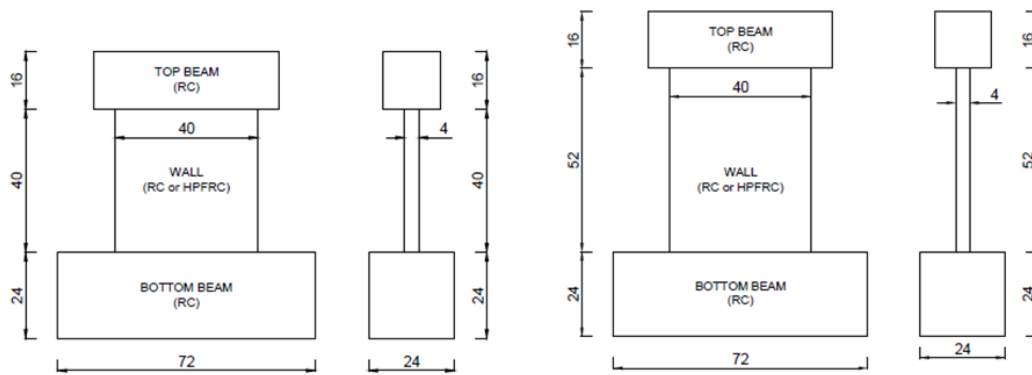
Dimensions of test specimen (Athanasopoulou et al., 2012)
